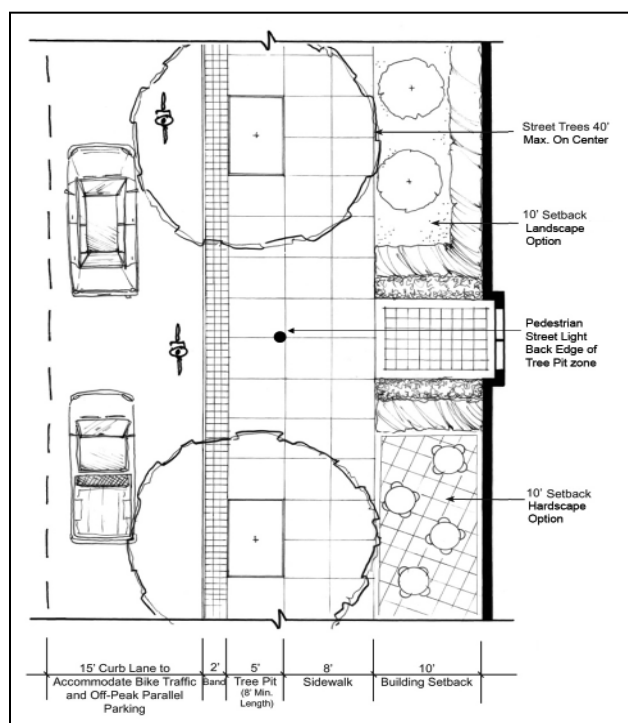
Where off-peak on-street parking may be allowed in North Laurel and in the TOD District along major pedestrian links to MARC stations, a 2-foot wide band of concrete pavers or stamped concrete located along the edge of the roadway will offer ease of access for those exiting parked cars. Figure 3.6 is a section view of this right-of-way detail.
